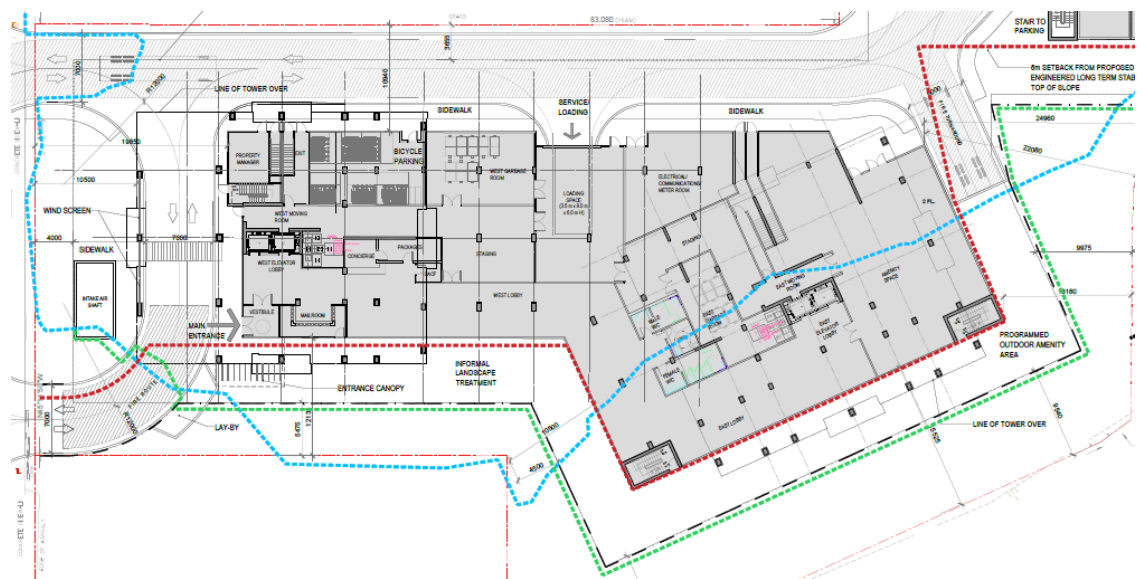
Proposed Ground Floor Plan of Podium, Prepared by IBI Group
